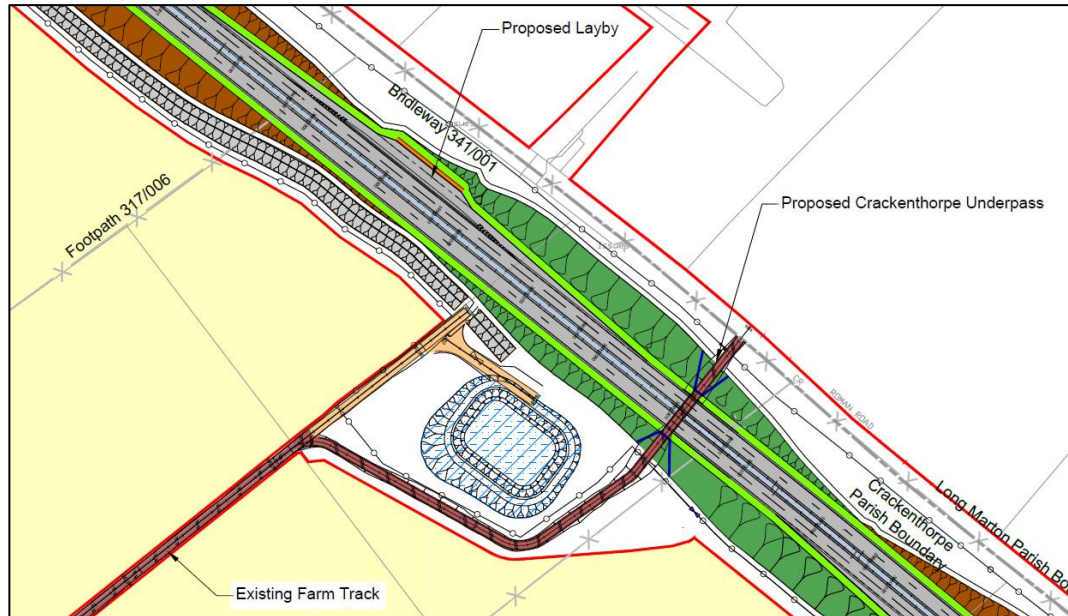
(b) Extract from General Arrangement Drawing (After)
